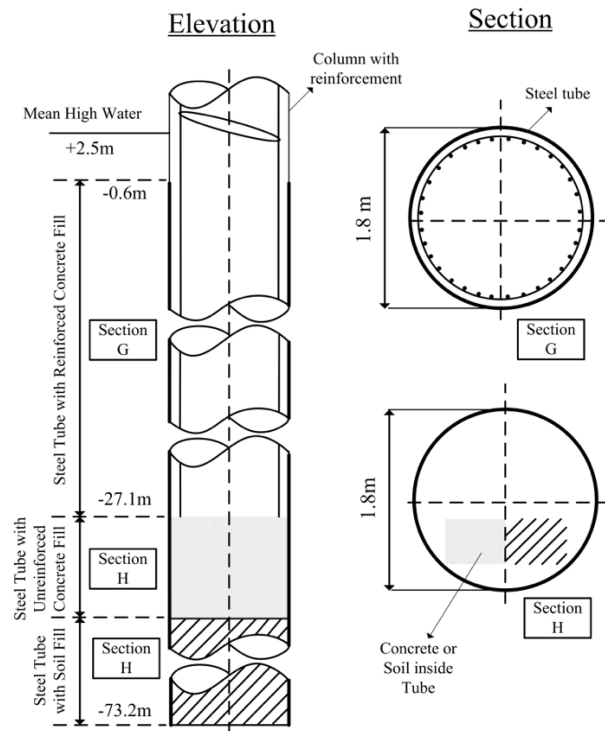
Typical configuration RC pier-to-CFST pile connection (courtesy of WSDOT)
